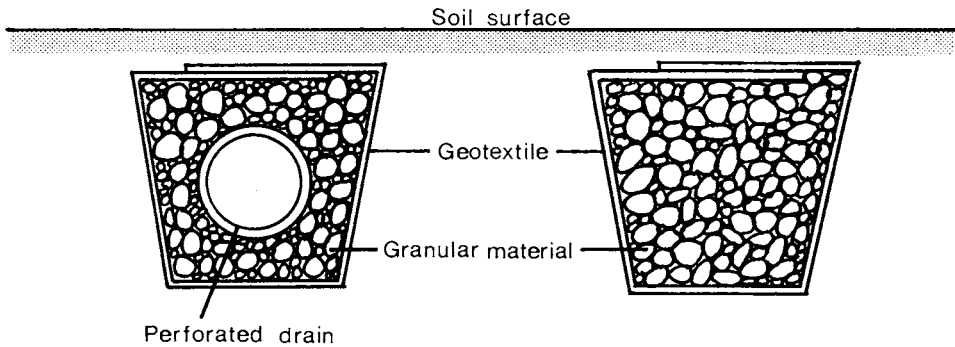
Geotextiles used to wrap rock drains with or without a drain pipe.
